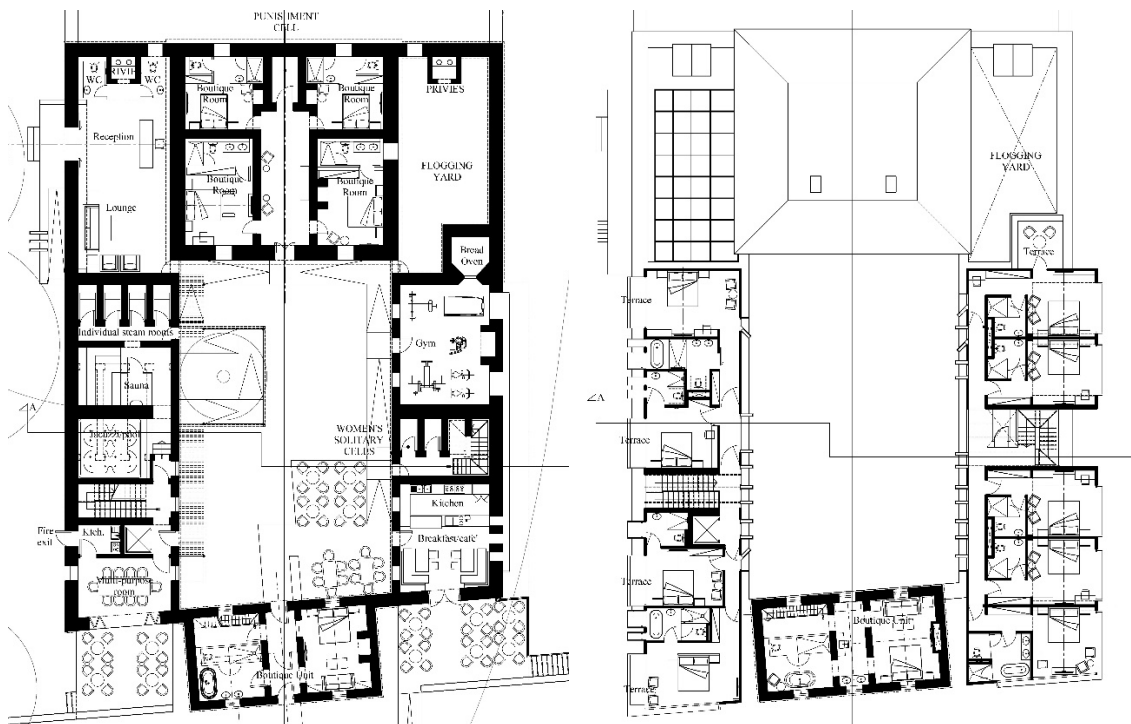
Ground floor plan (left) and first floor plan (right). Drawings not to scale
